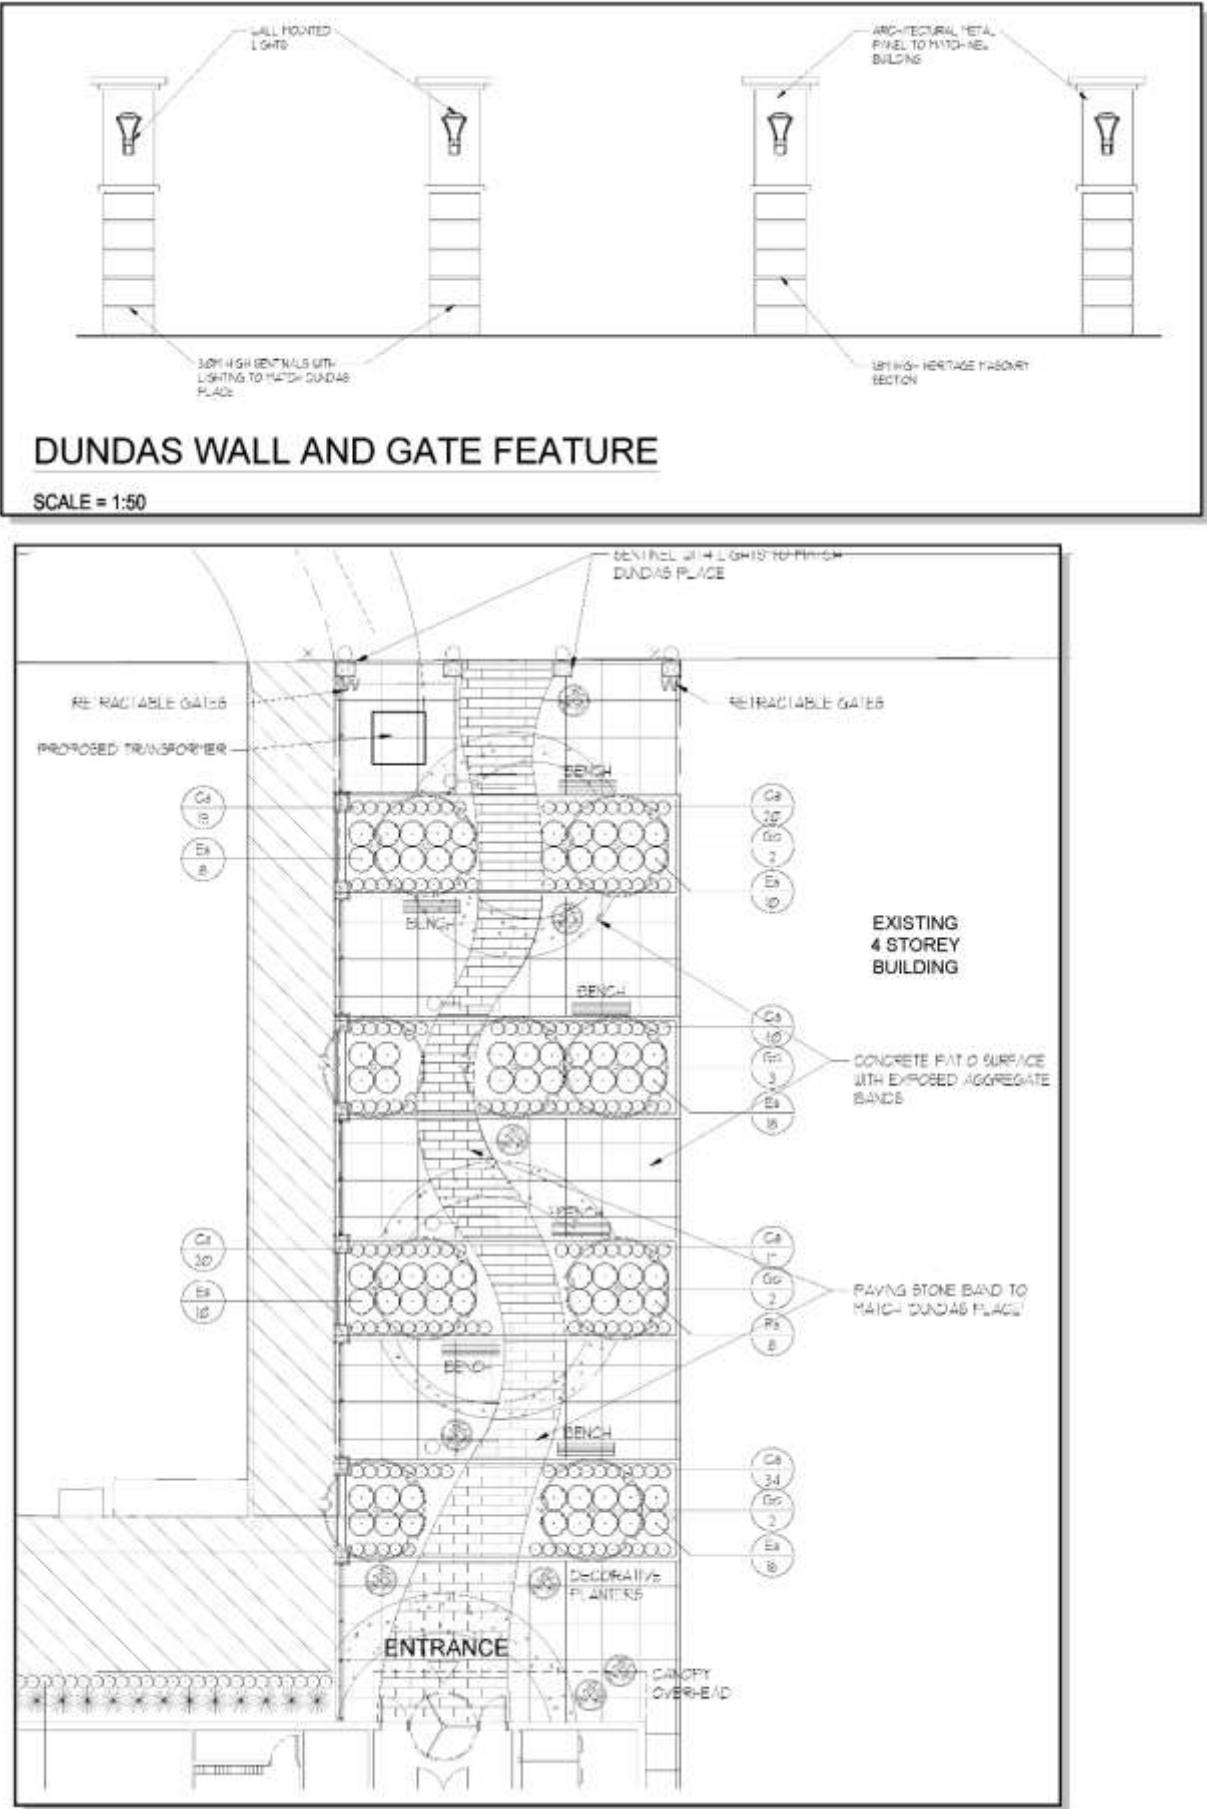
Dundas wall and gate feature and enlarged landscape plan of forecourt/amenity space.
